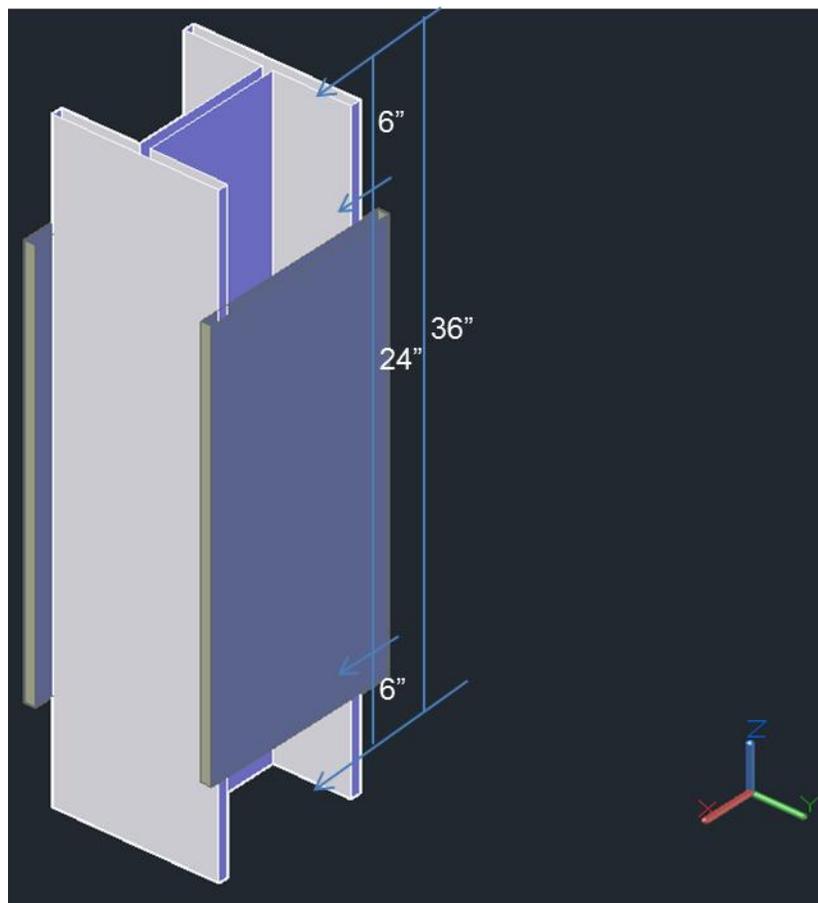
Lab replica of bridge H-pile repair plate with dimensions
